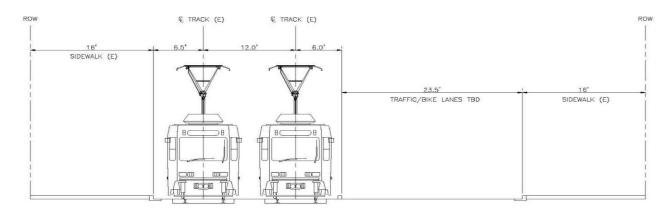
Typical H Street Cross Sections with Light Rail Tracks (facing east)
